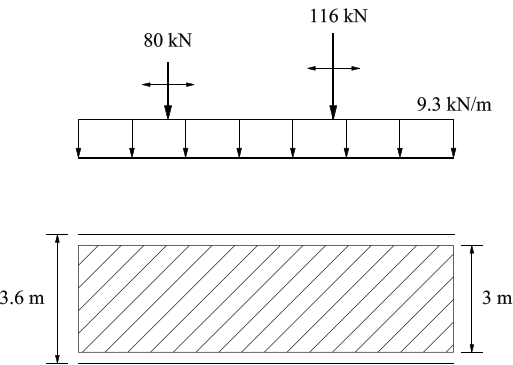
Elevation and plan view of HS20-44 lane loading.
